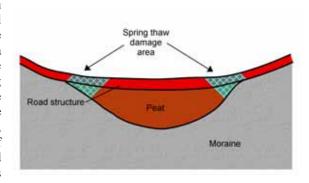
Location of spring thaw damage in road sections resting on peat.
